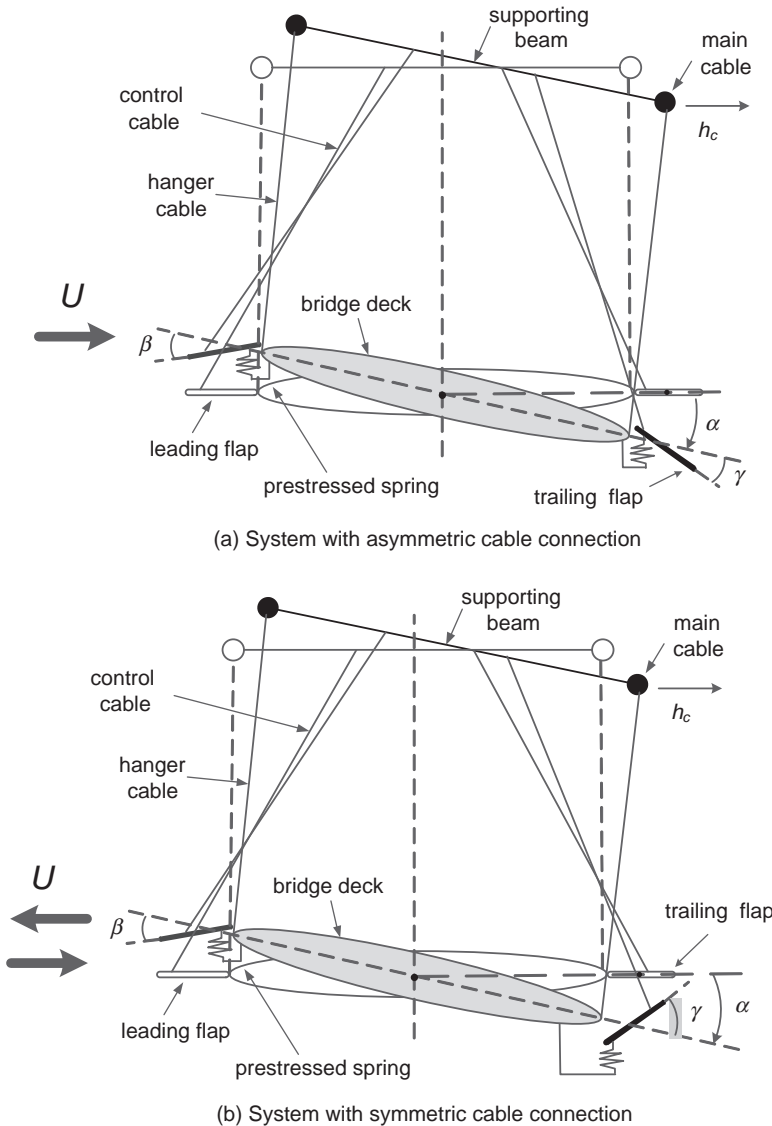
Cross-section of bridge deck with active flaps for flutter control.
